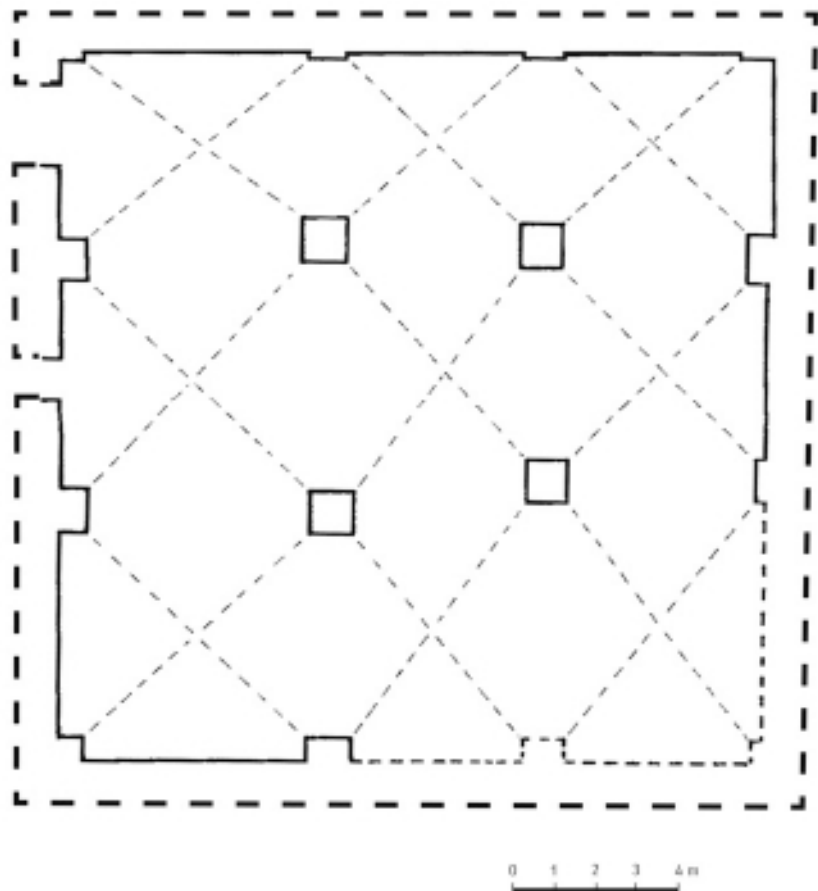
Plan of palace in Genoese quarter ('Rotary Building'), Acre (House 1:15) (drawing by author).
